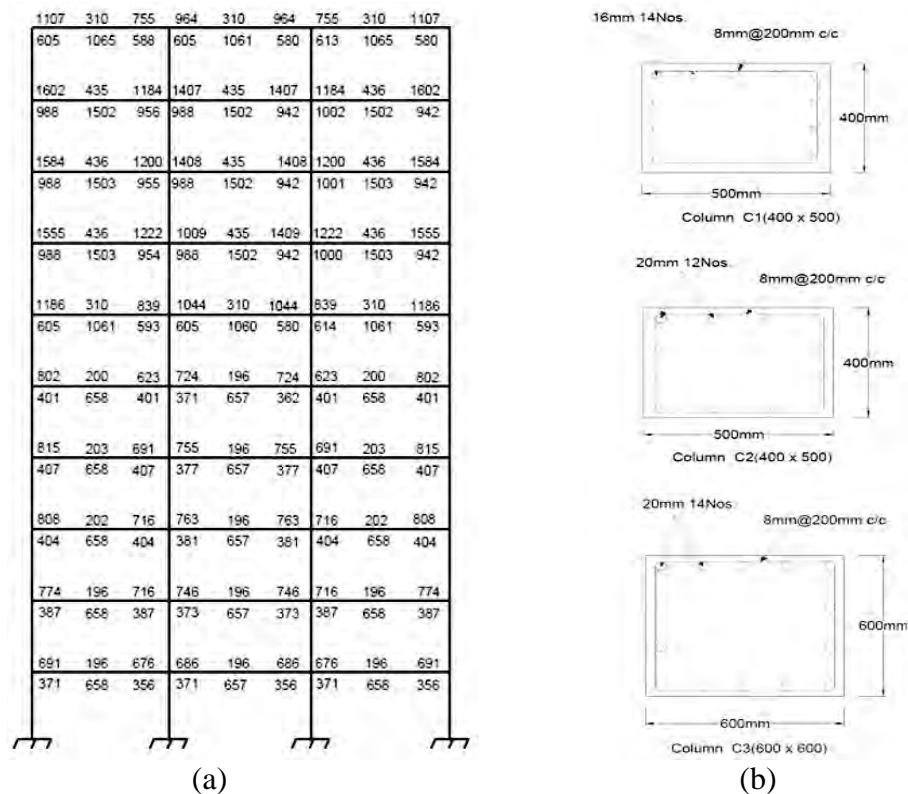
Details of 10-storey frame (a) Longitudinal reinforcement in beams (mm²)
